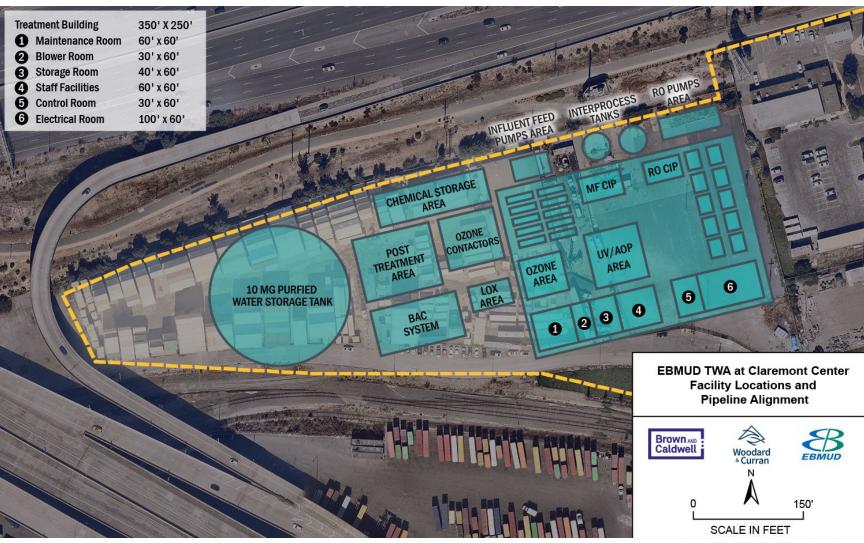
Site Layout for TWA EBMUD 30-mgd AWPF
